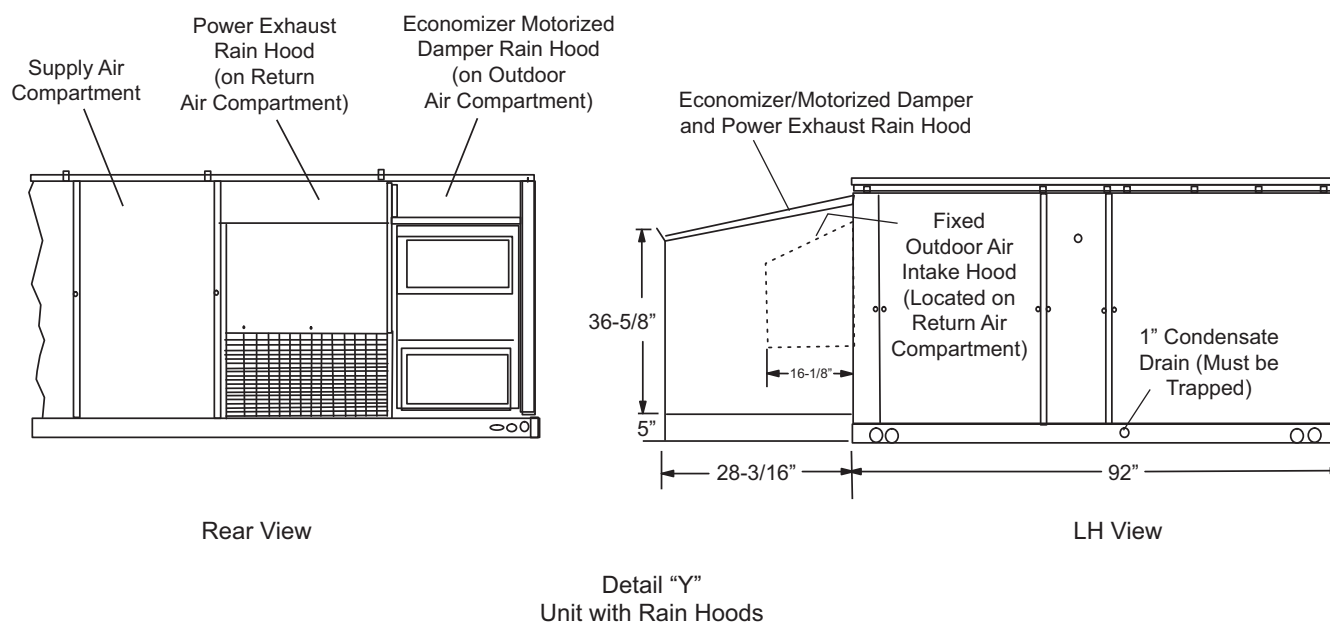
J15 thru 25 ZR Unit Dimensions Rain Hood
